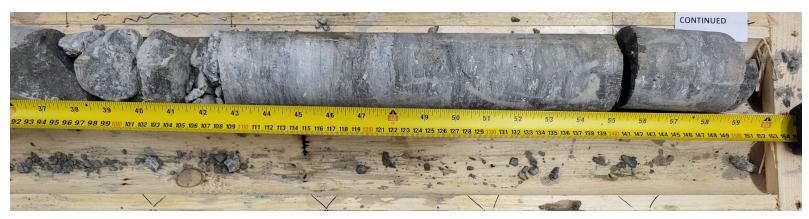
BH201 - Box 1 (Photo 3 of 3) - Run Nos. 1 - 4
